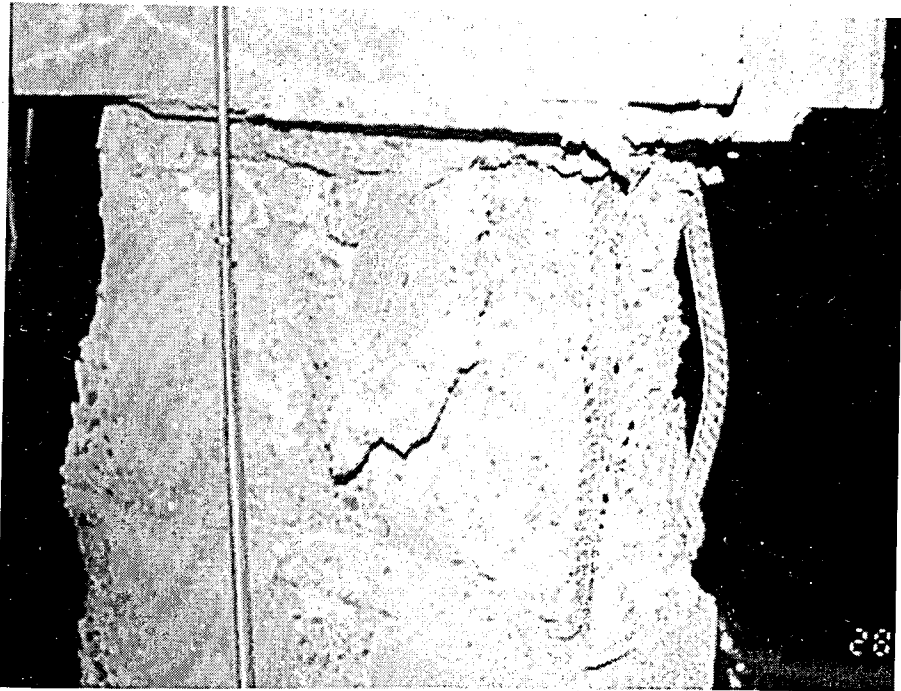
Buckling of the reinforcement and crushing of the concrete core (C3)
